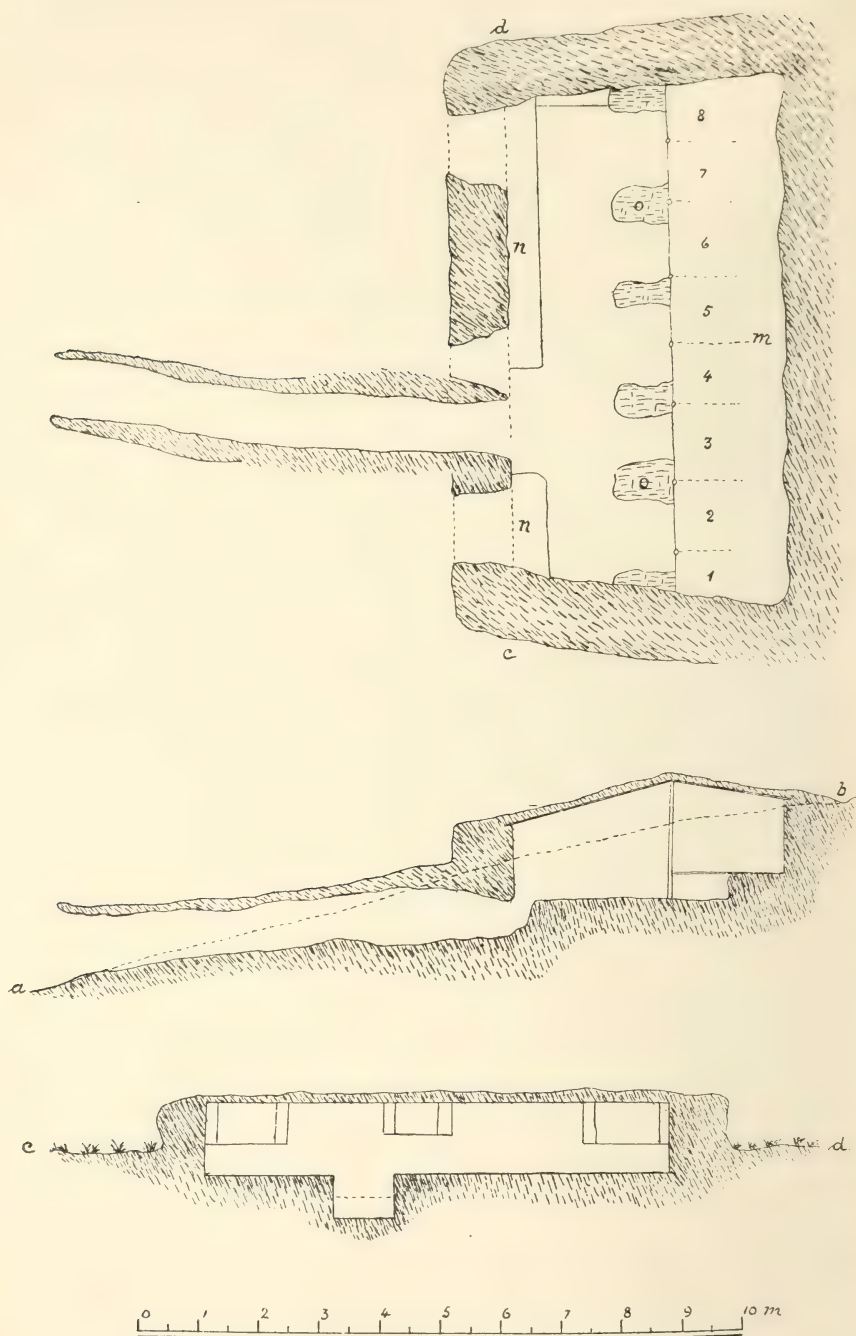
Ground-plan and sections of a winter house at Angmagssalik. (Holm).
